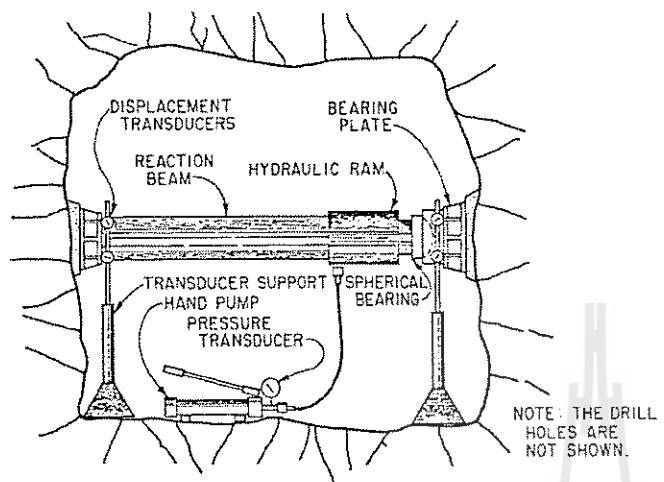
Typical Rigid Plate Bearing Test Setup Schematic
